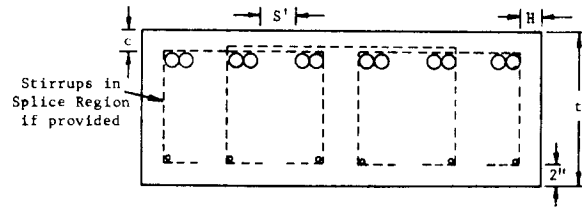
Typical cross section of #6, #8, and #11 bar specimens with all bars spliced (shown in testing position)
